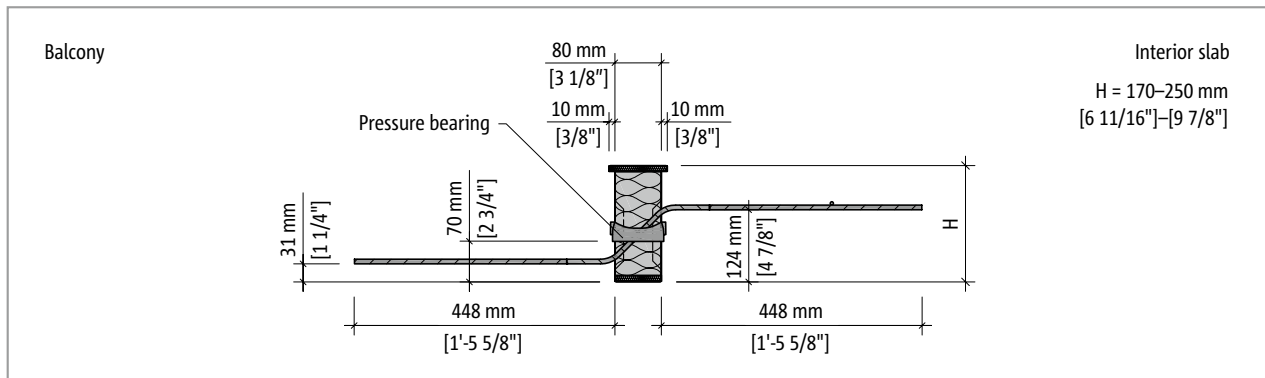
Schöck Isokorb® T Type CQ-V6: Product cross-section
